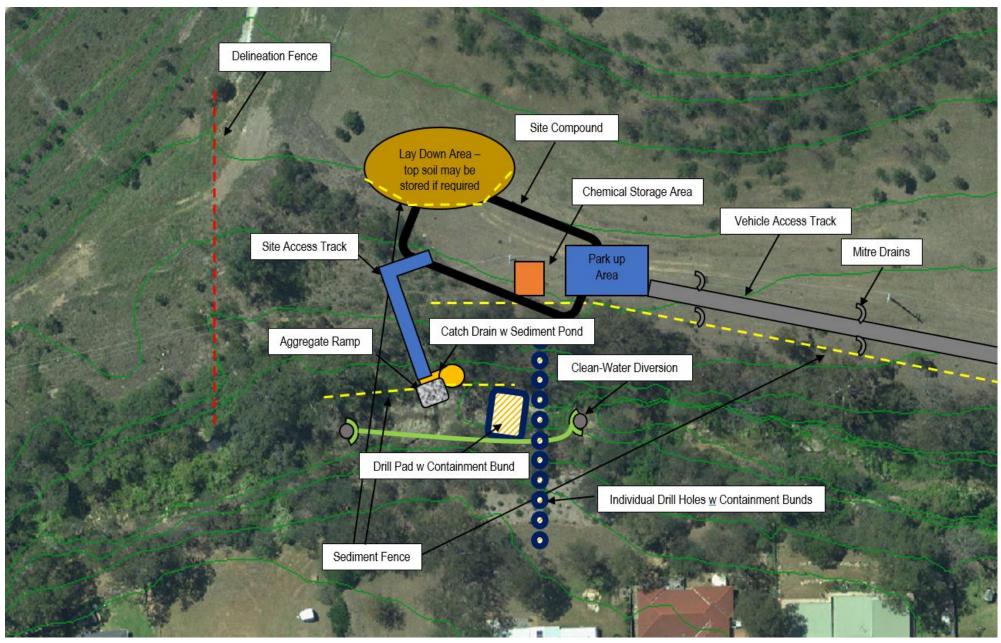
Proposed Site Layout and Erosion and Sediment Controls. Note control locations are subject to change pending installation of Site Layout
